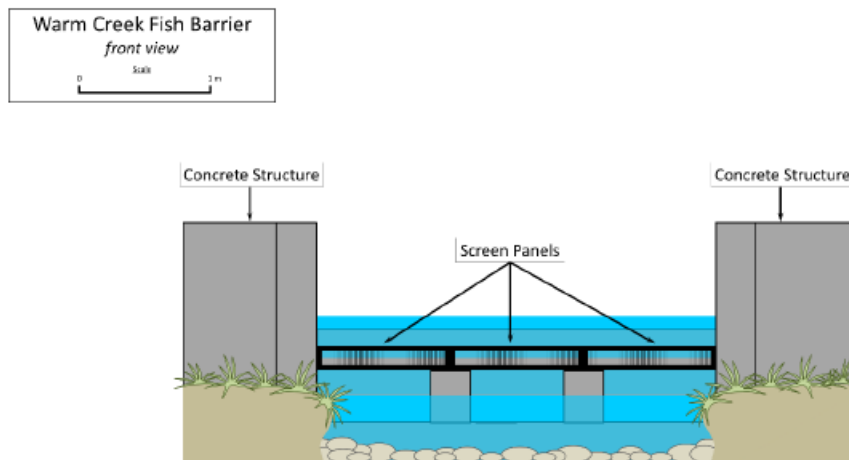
Warm Creek barrier design – front view. The barrier could undergo some modifications in design during construction.
